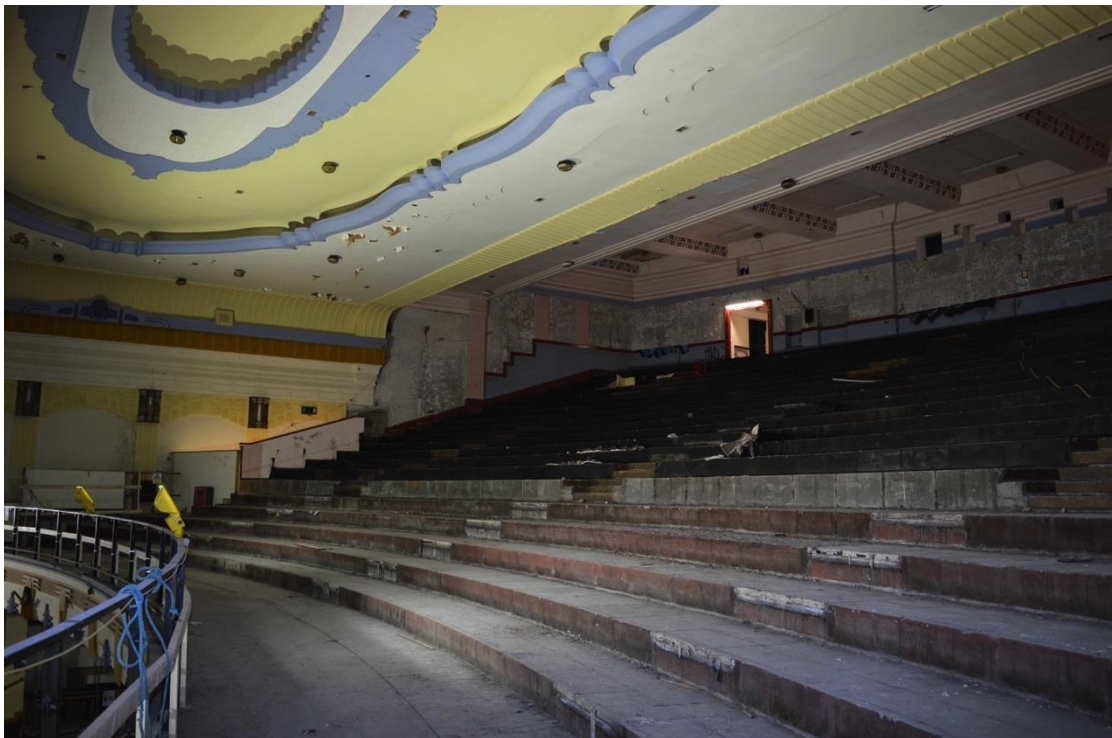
Third floor, view of balcony, facing south-east (7533_0059)
